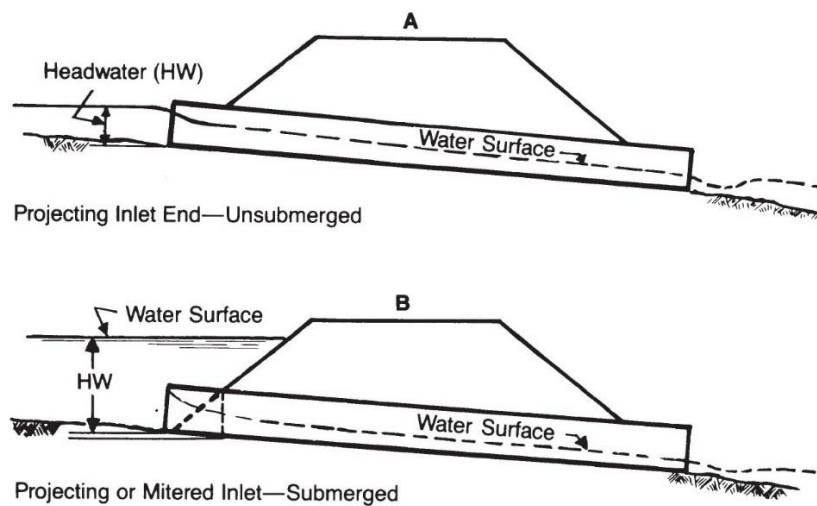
Inlet Control (American Iron and Steel Institute, 1983)
